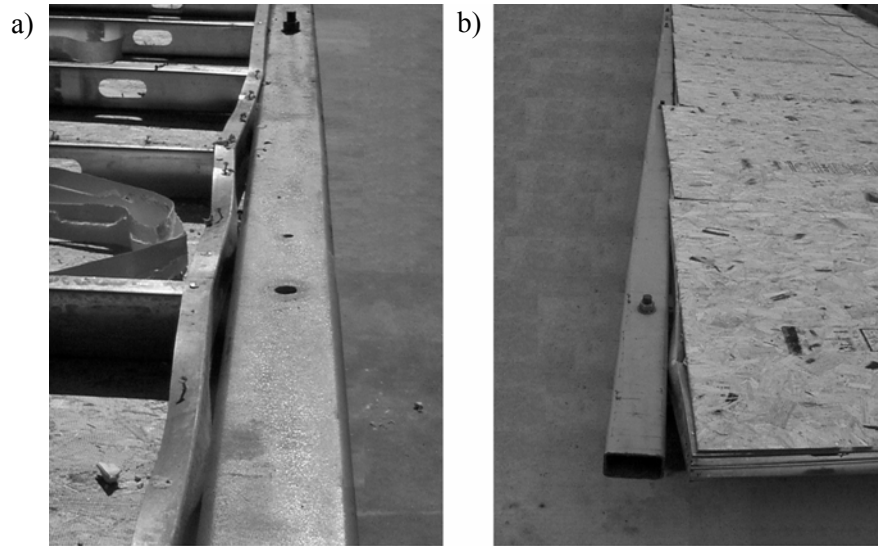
Bending of top plates: a) wall Amongyp1, b) wall Amon.
